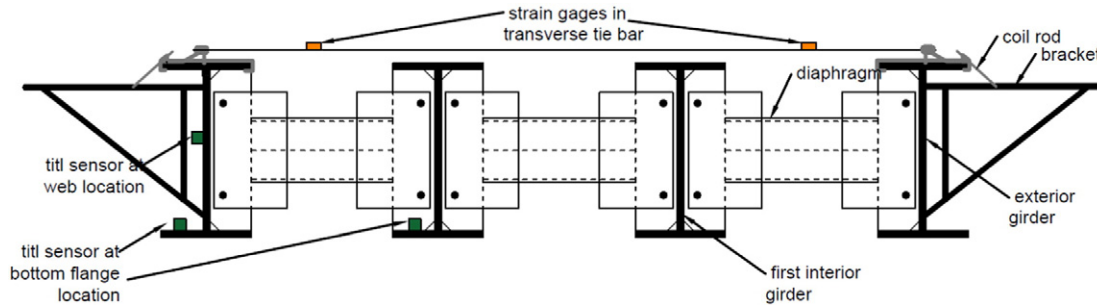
Location of tilt sensors and strain gages for a bridge with transverse tie arrangement.
